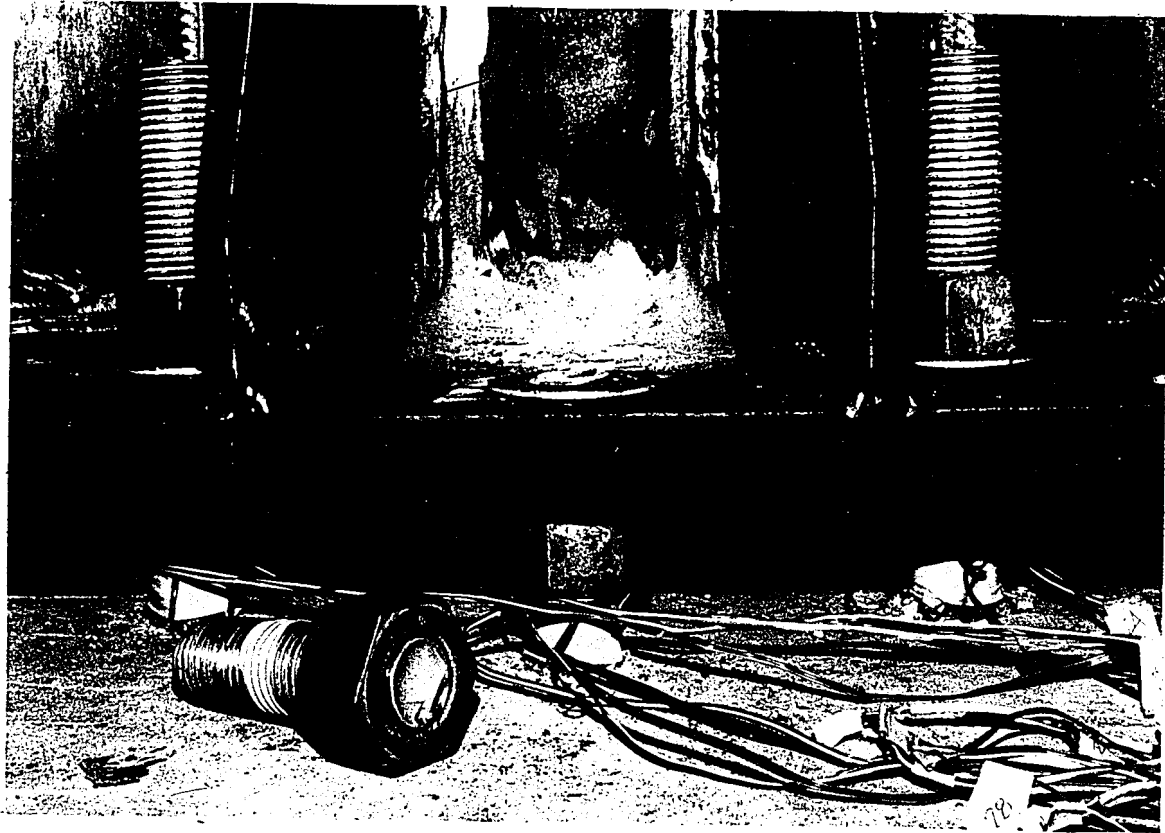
Closeup Photograph of Failure Location at Anchor Bolt
